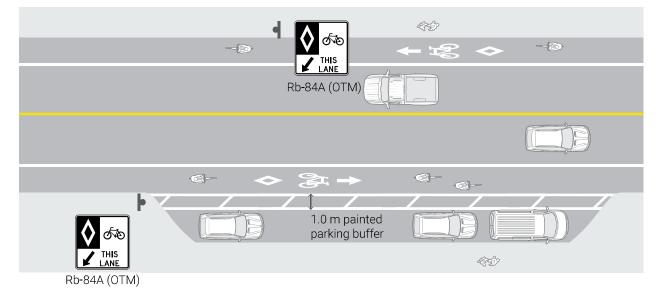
Conventional Bicycle Lane on Two-lane Road with On-street Parking
